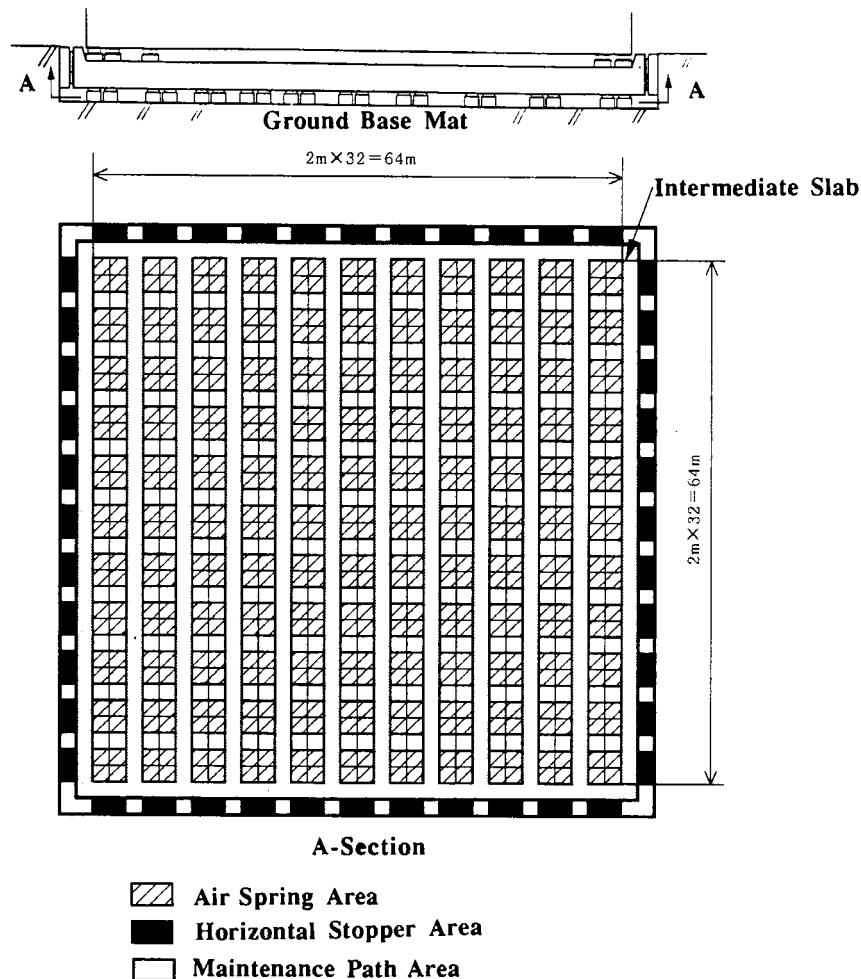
Arrangement of Air Springs and Horizontal Stoppers
